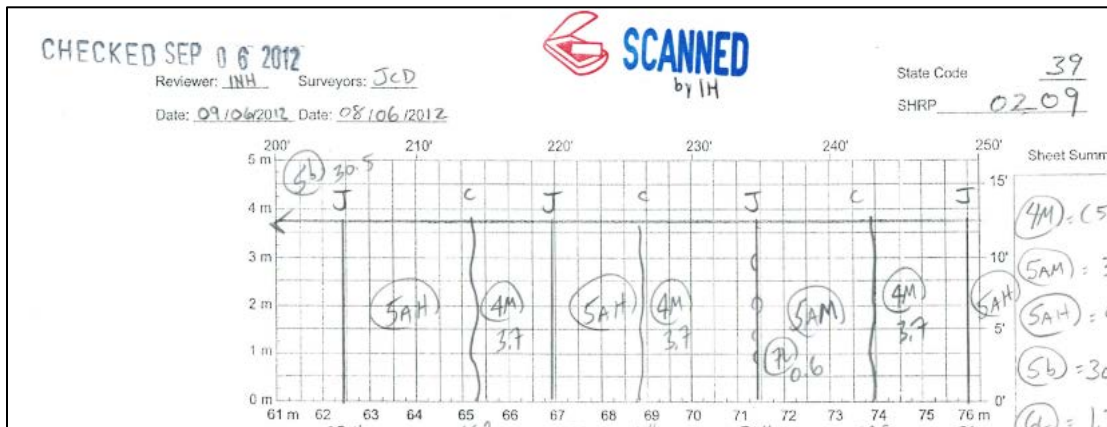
Manual Distress Survey of Cracked LTPP Test Section (InfoPave™)
